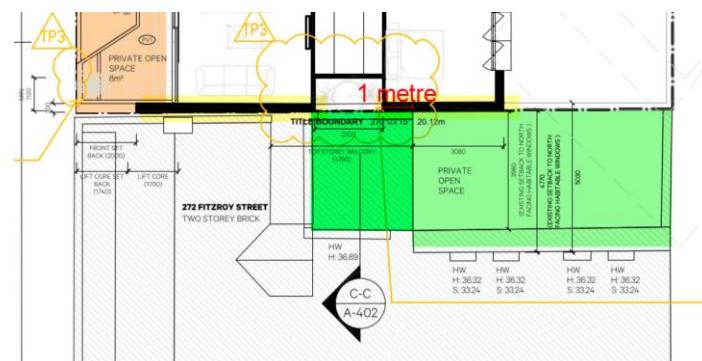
shows the extent of boundary wall located opposite the first floor balcony (dark green) is 1m in width.
